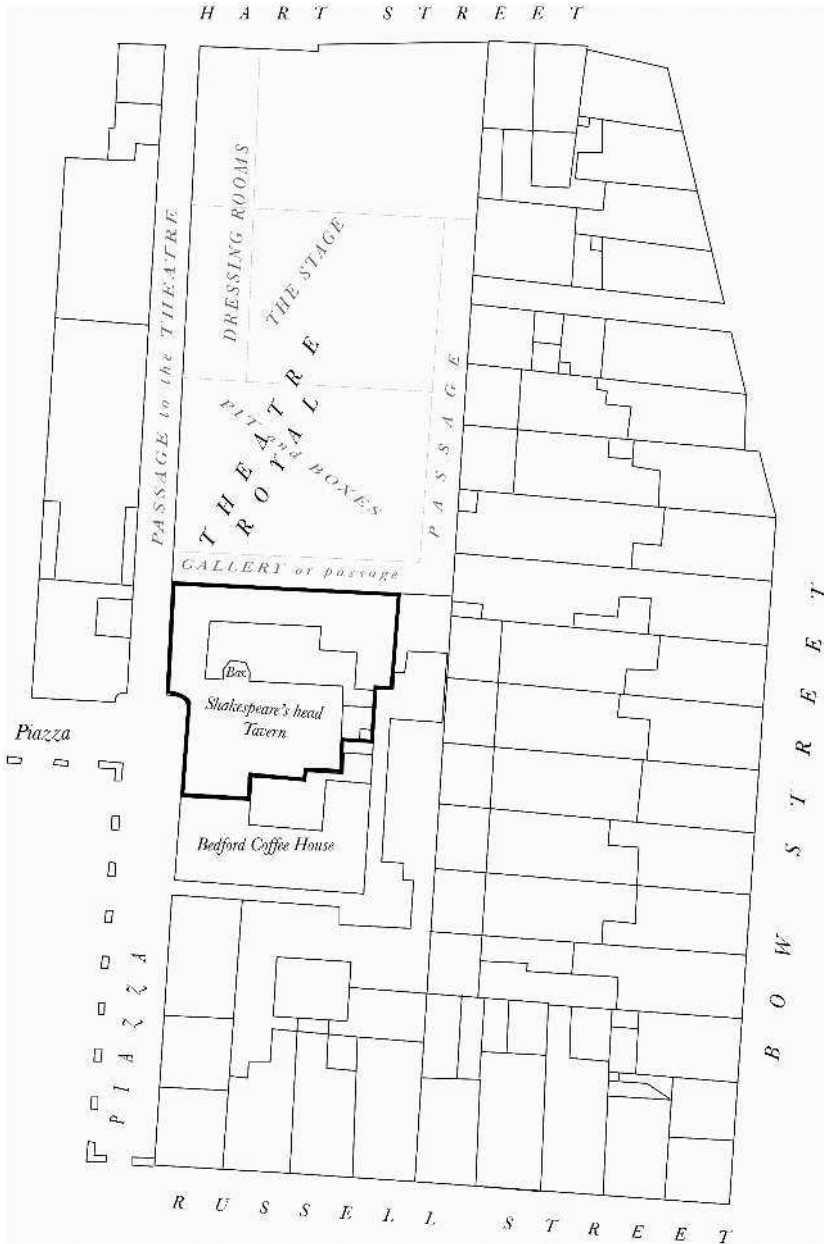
Site plan of the northeast corner of the great piazza of Covent Garden.
